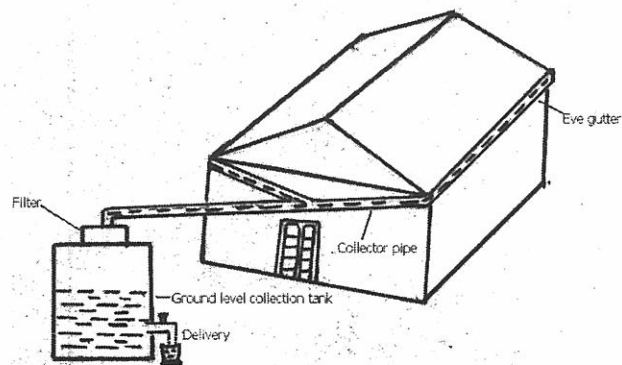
ROOF WATER HARVESTING STRUCTURE
